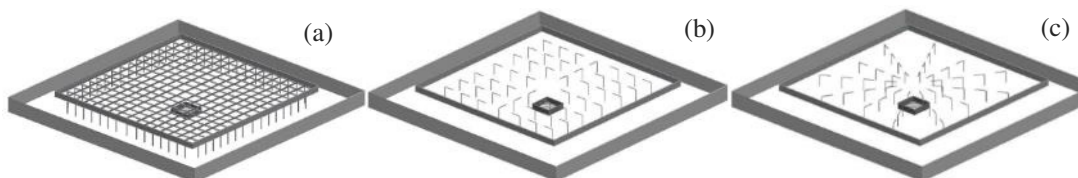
Detailing of reinforcement crossing the interface between concrete layers.
